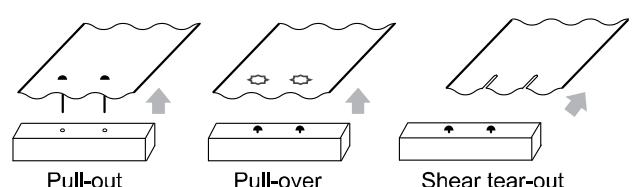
Three failure modes at attachments of GI sheets to roof structure.
